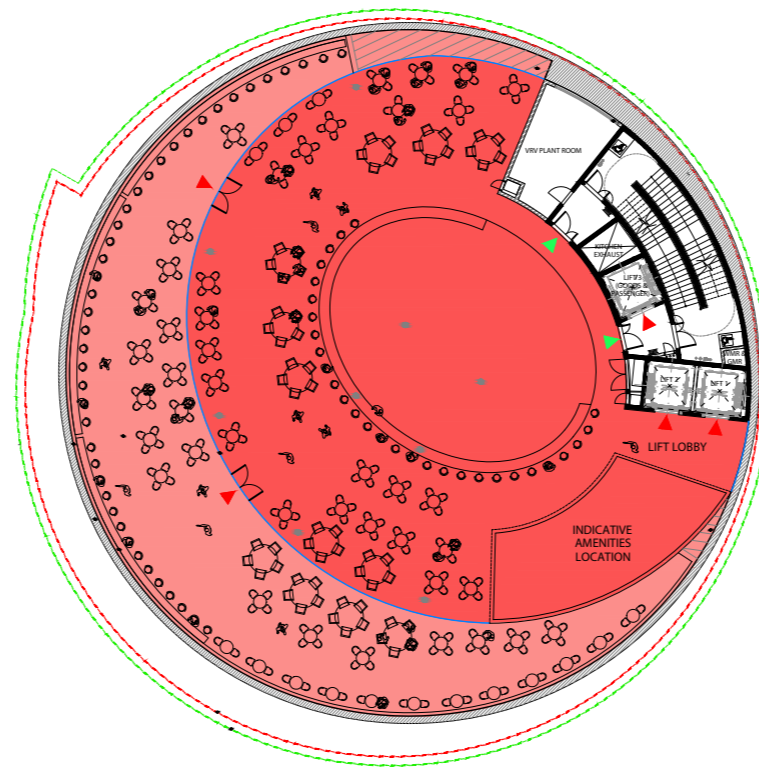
DA Level 5 Plan (with indicative fit out)
